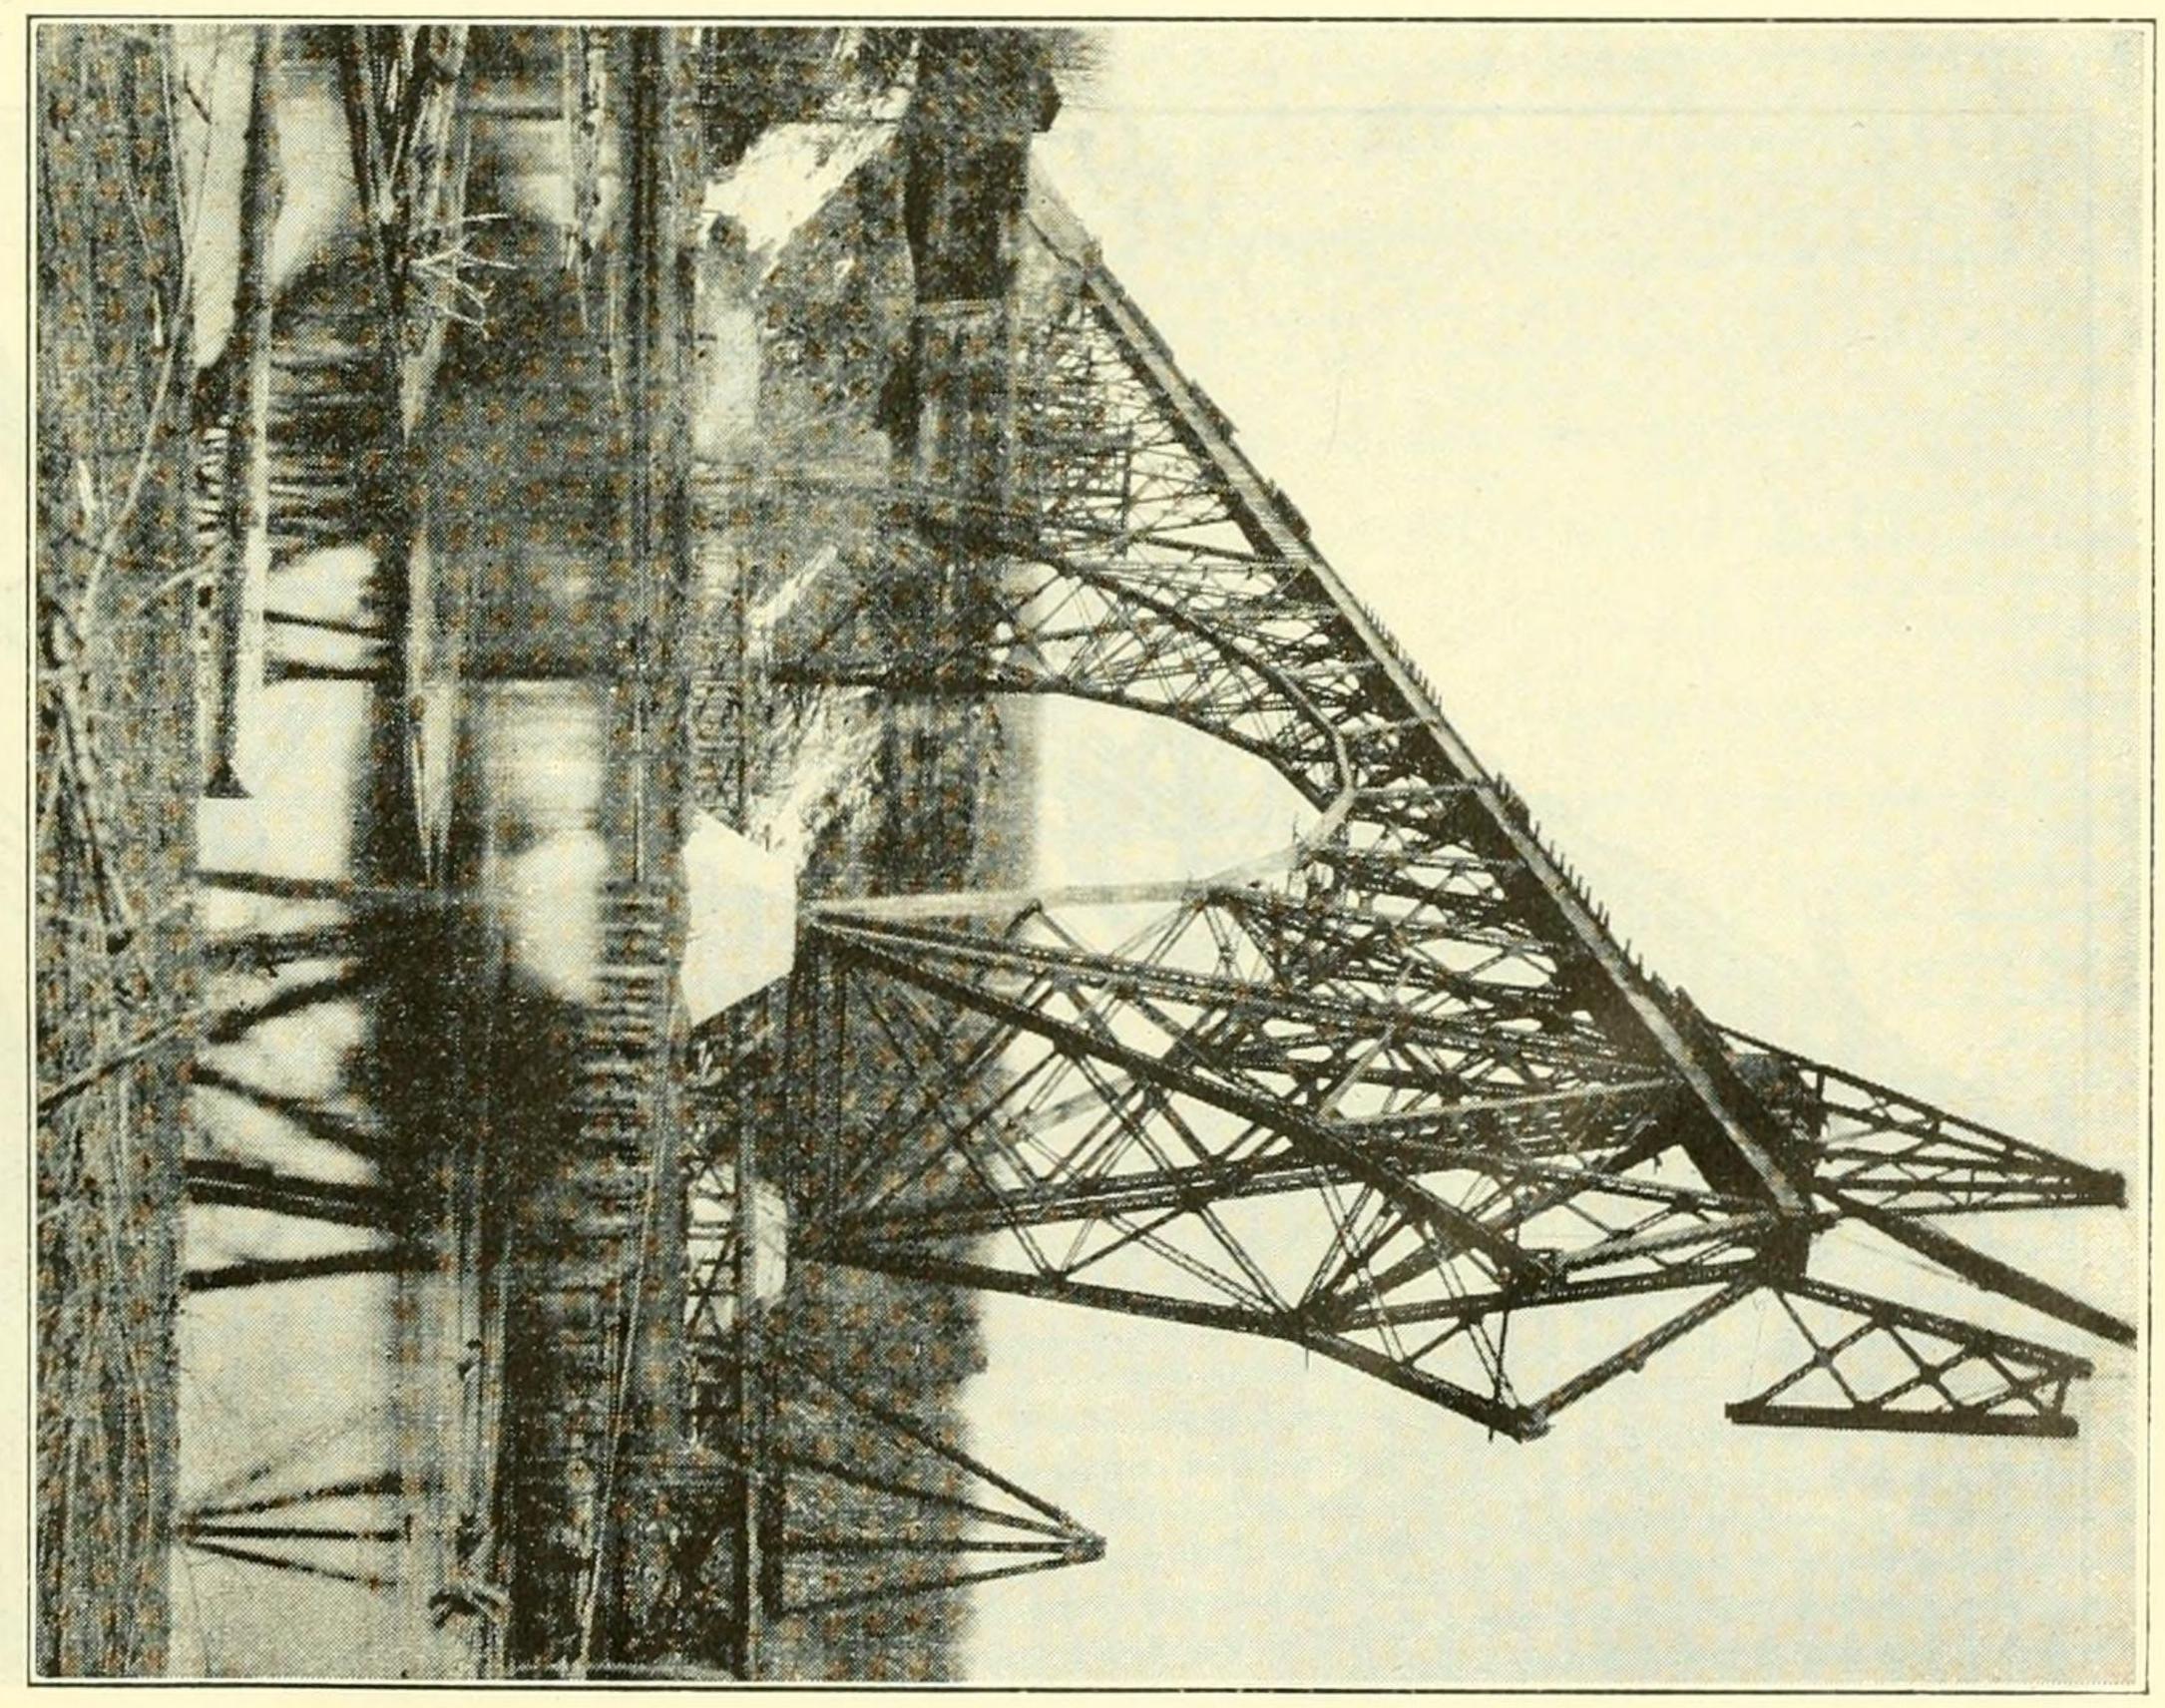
ERECTION OF EAST ARCH, ST. CROIX RIVER BRIDGE.
